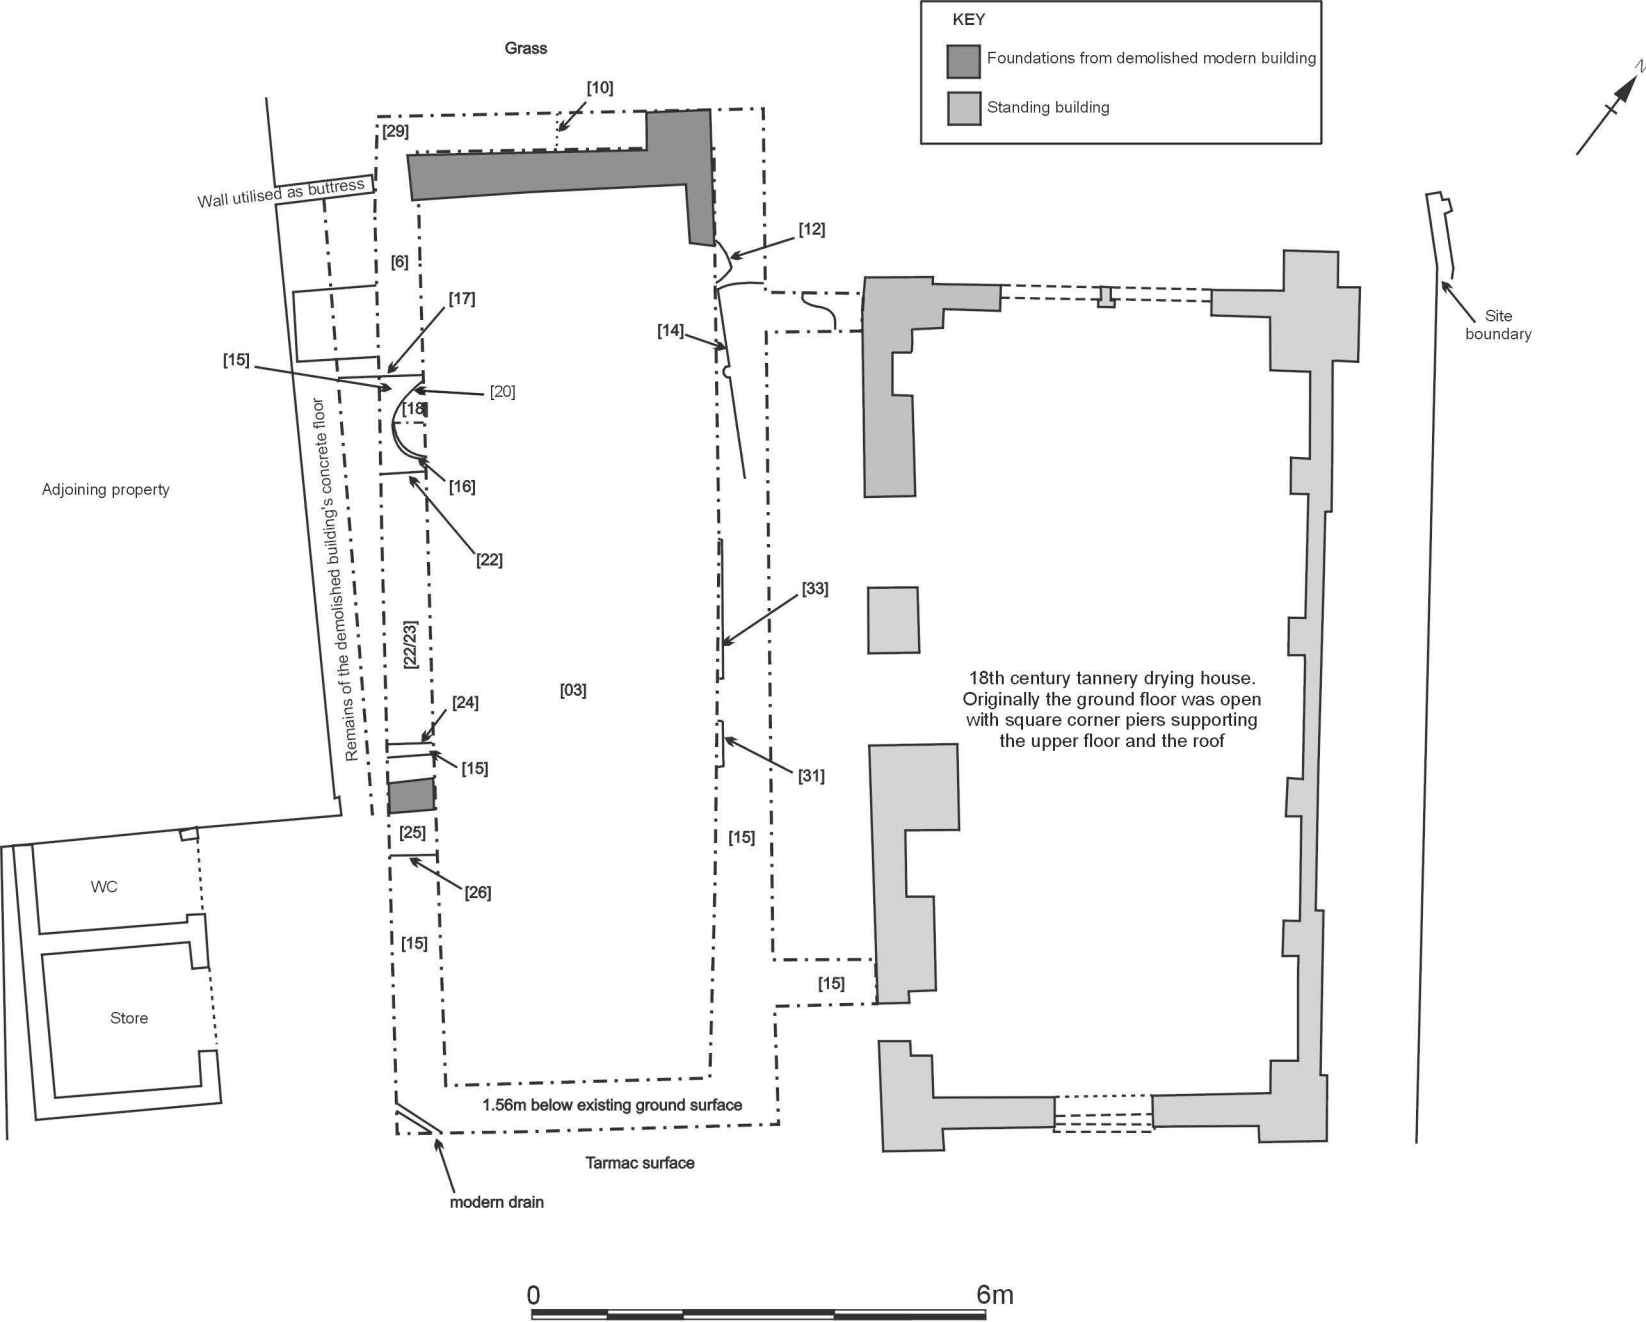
Plan of the site showing excavated trenches and the 'Old Chandlery' building
